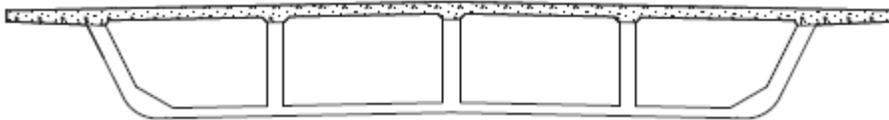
Typical Box Girder Cross-Section (Dead Load)
